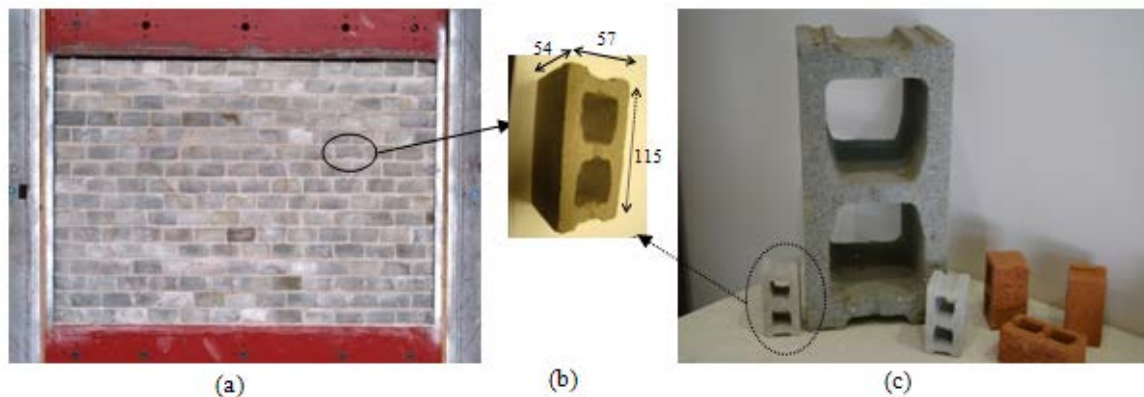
Masonry wall panel (b) Concrete masonry unit brick (all dimensions in mm) (c) Comparison between full scales and scaled down dimensions of masonry unit
